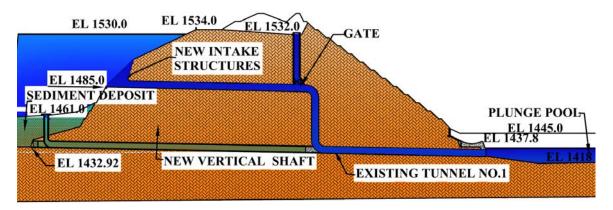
Longitudinal section of flushing tunnel using the existing tunnel No. 1
